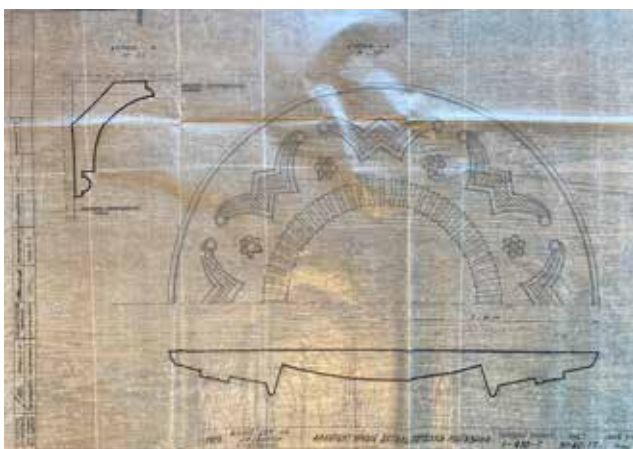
Construction of a residential building of the 1-430 series standard project in Liepāja, Brīvības Street (1956).
